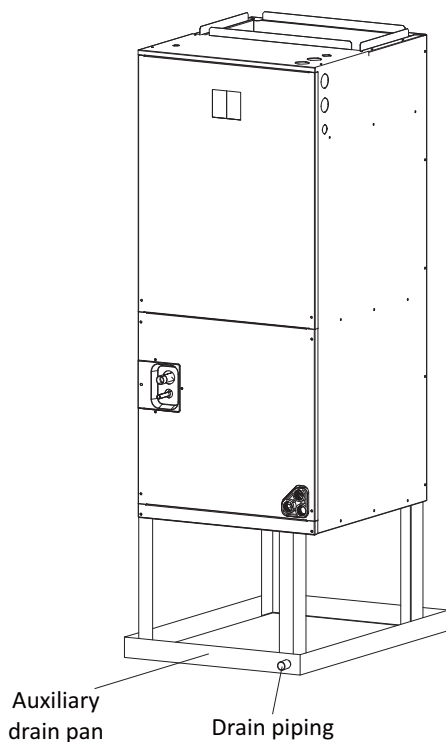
A - Vertical Upflow Installation (Floor-Mounted)
